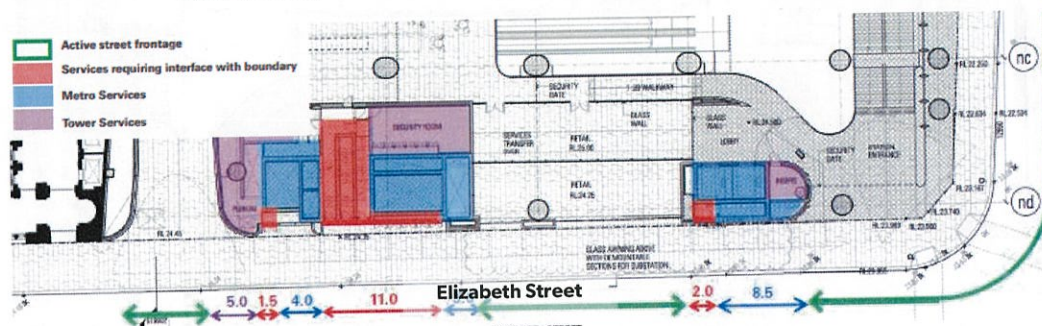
| Floor plan showing Elizabeth Street conditions including active frontages in green arrows and services/access in blue, red and purple arrows (Source: Applicant’s Rts)
